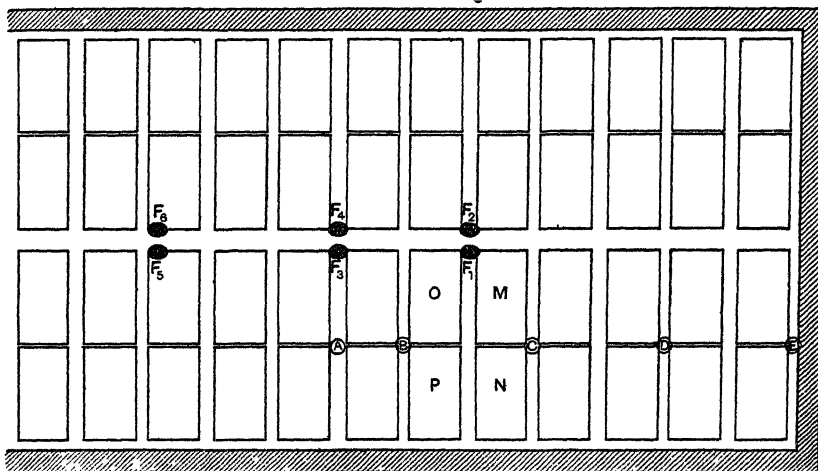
Plan of shed showing position of fans with regard to looms and points at which observations were made.
